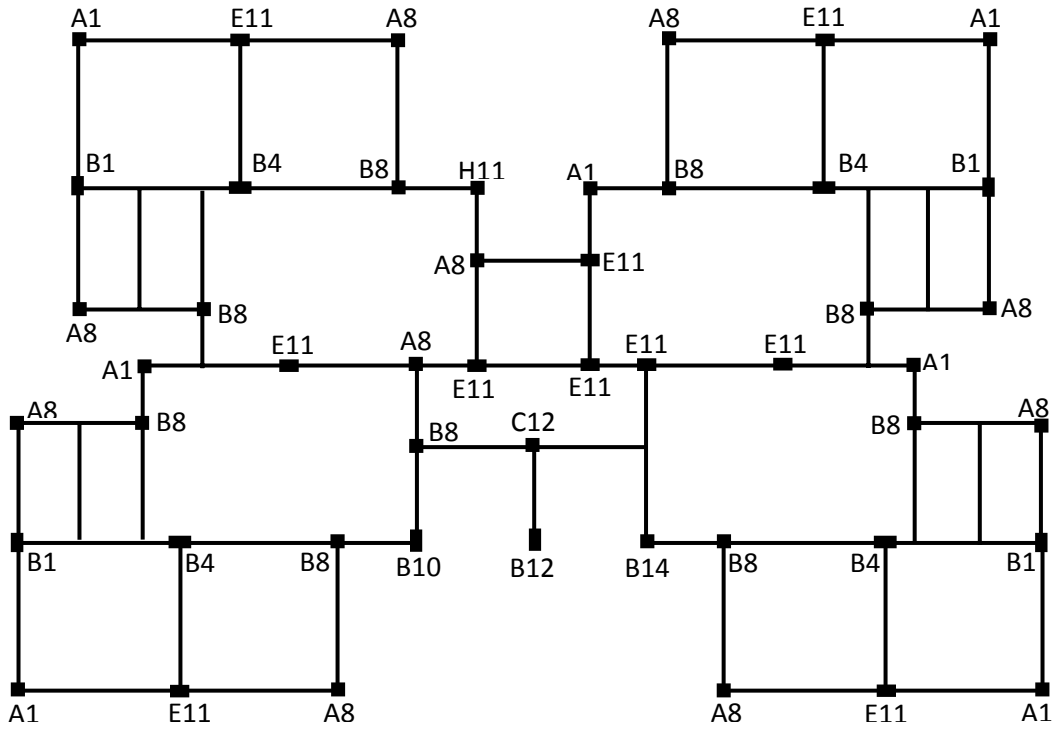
Floor (for Plinth, Ground, First and Second) framing plan – Beam location
